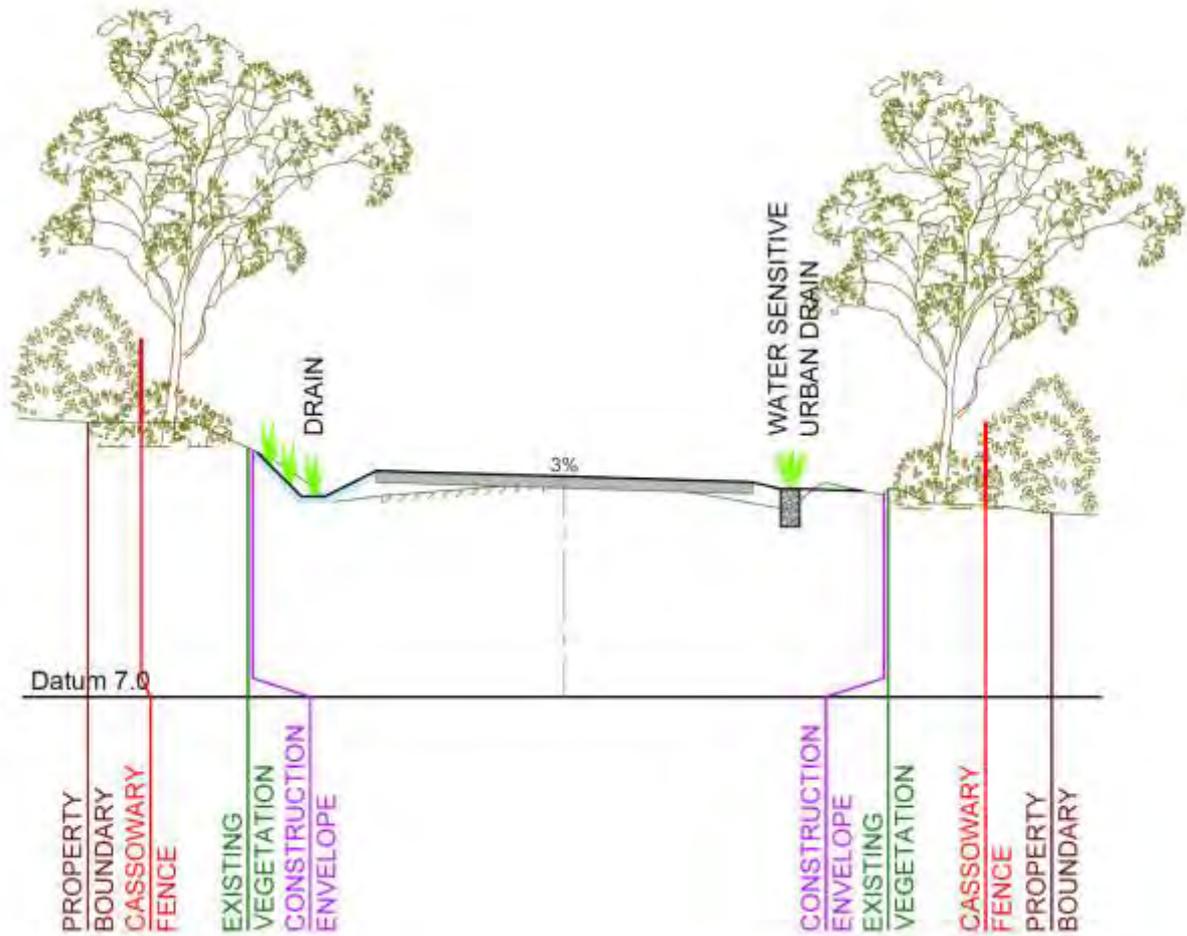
Typical cross section of Ella Bay Road (CH0760).
